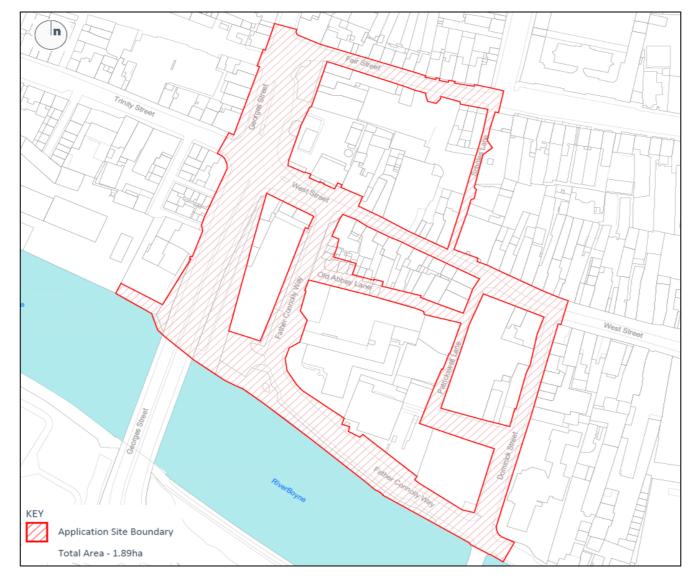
Extract from the Site Location Plan accompanying the Planning Application
